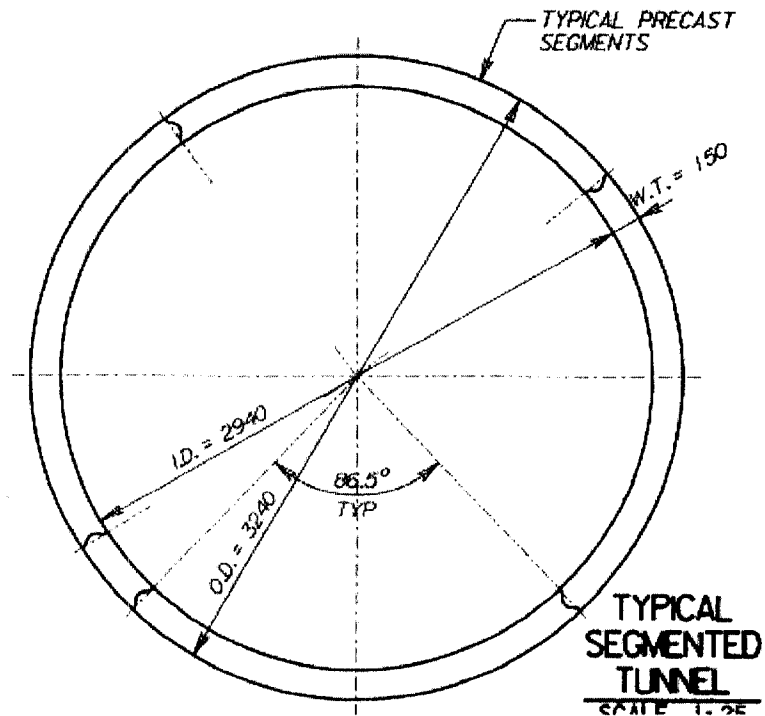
Typical pre-cast segmental concrete lining (City of Edmonton)
